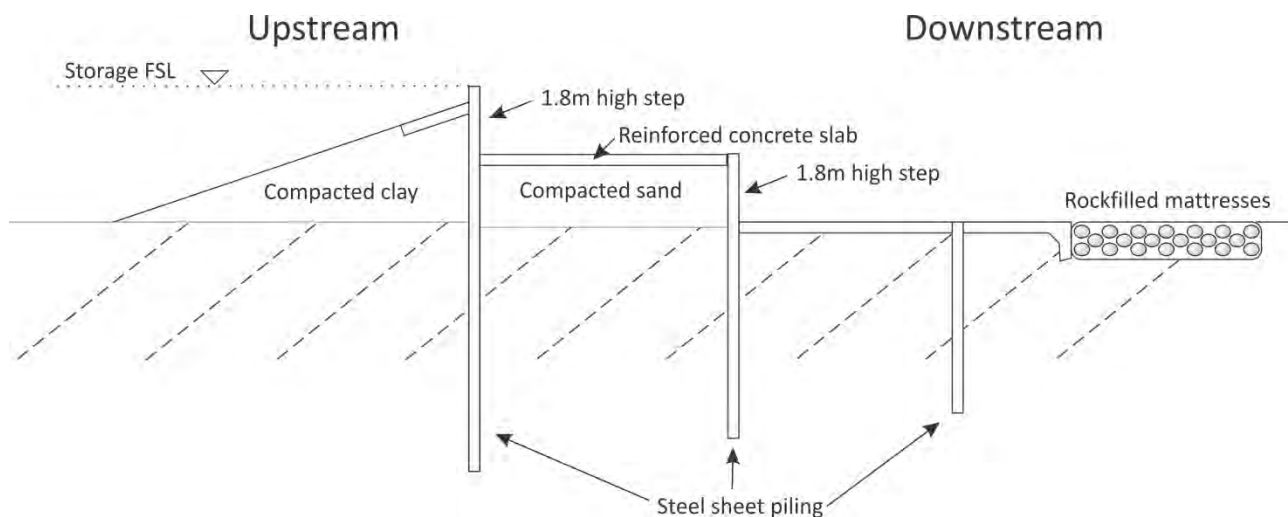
Schematic cross-section diagram of sheet piling weir
